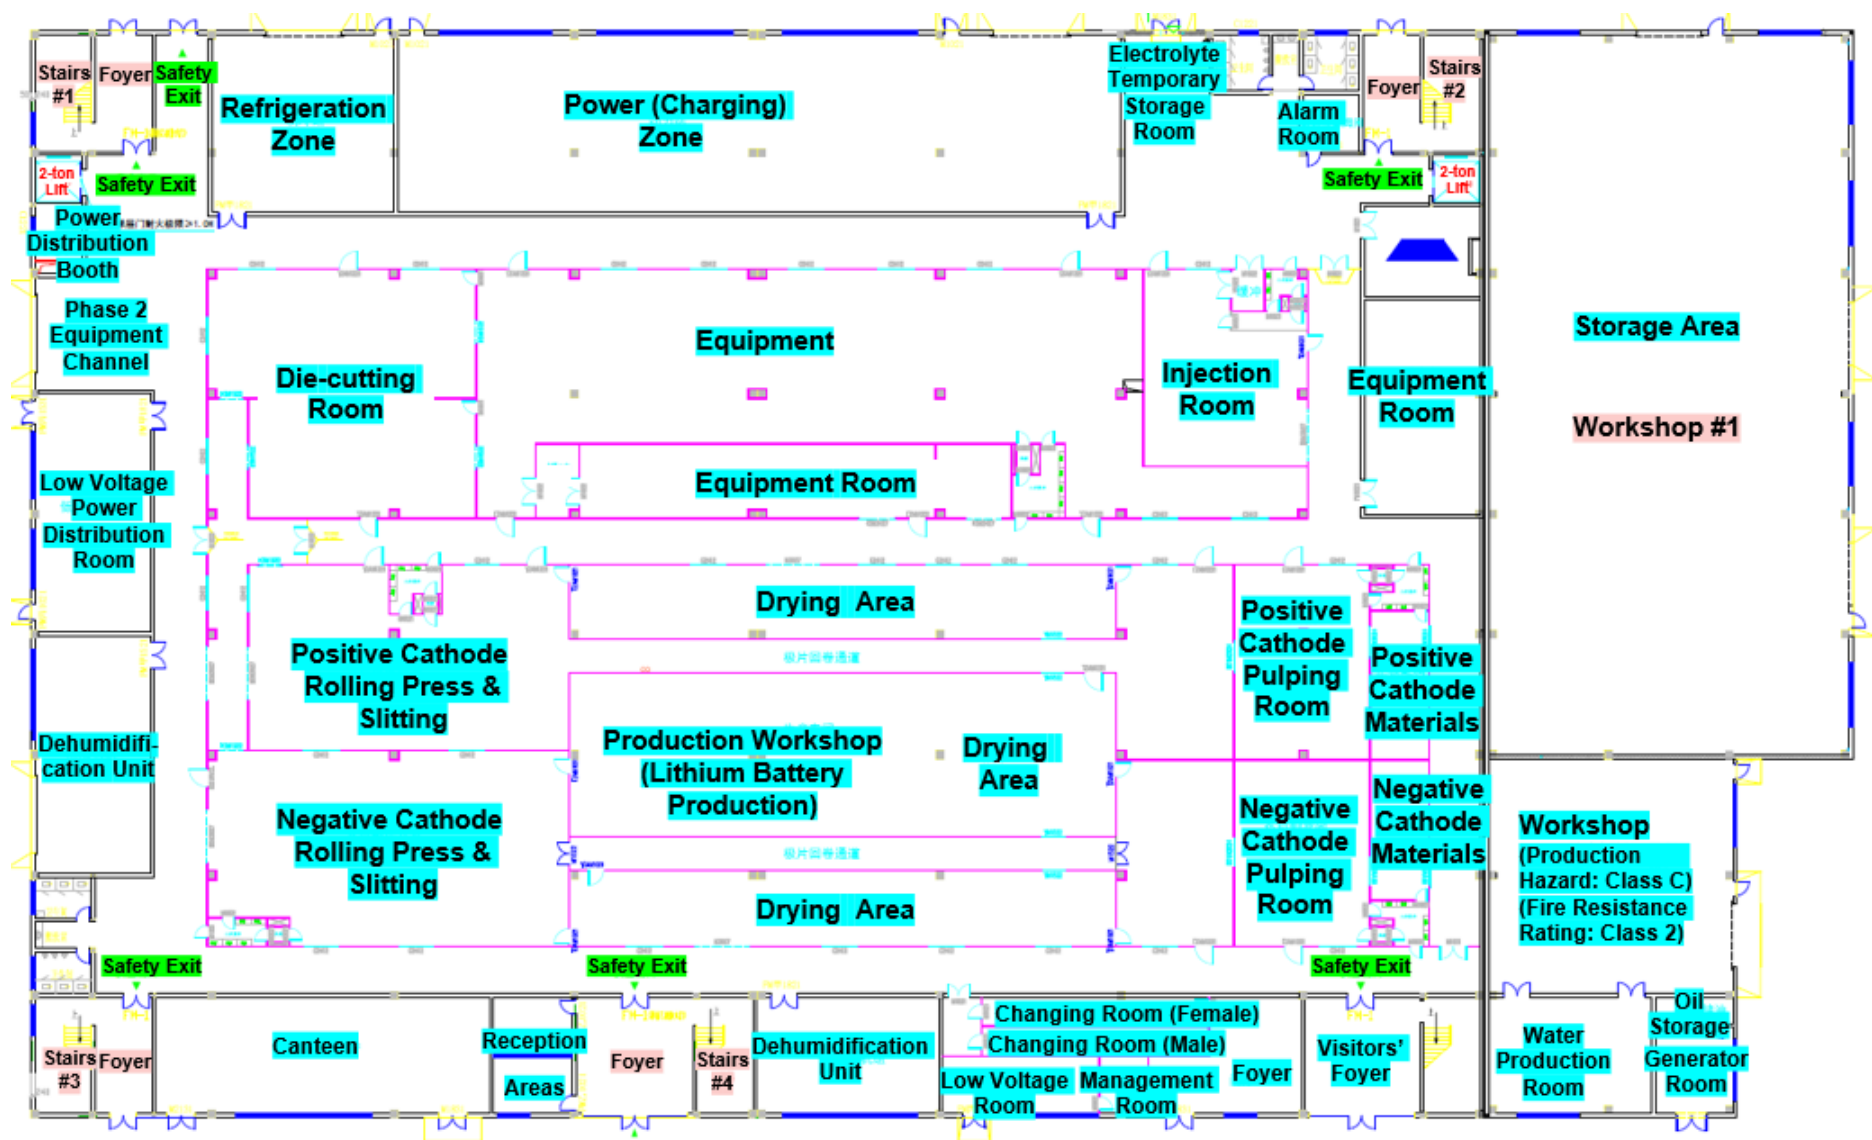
Level 1 Floorplan of Suzhou Durapower Battery Manufacturing Facility in China
